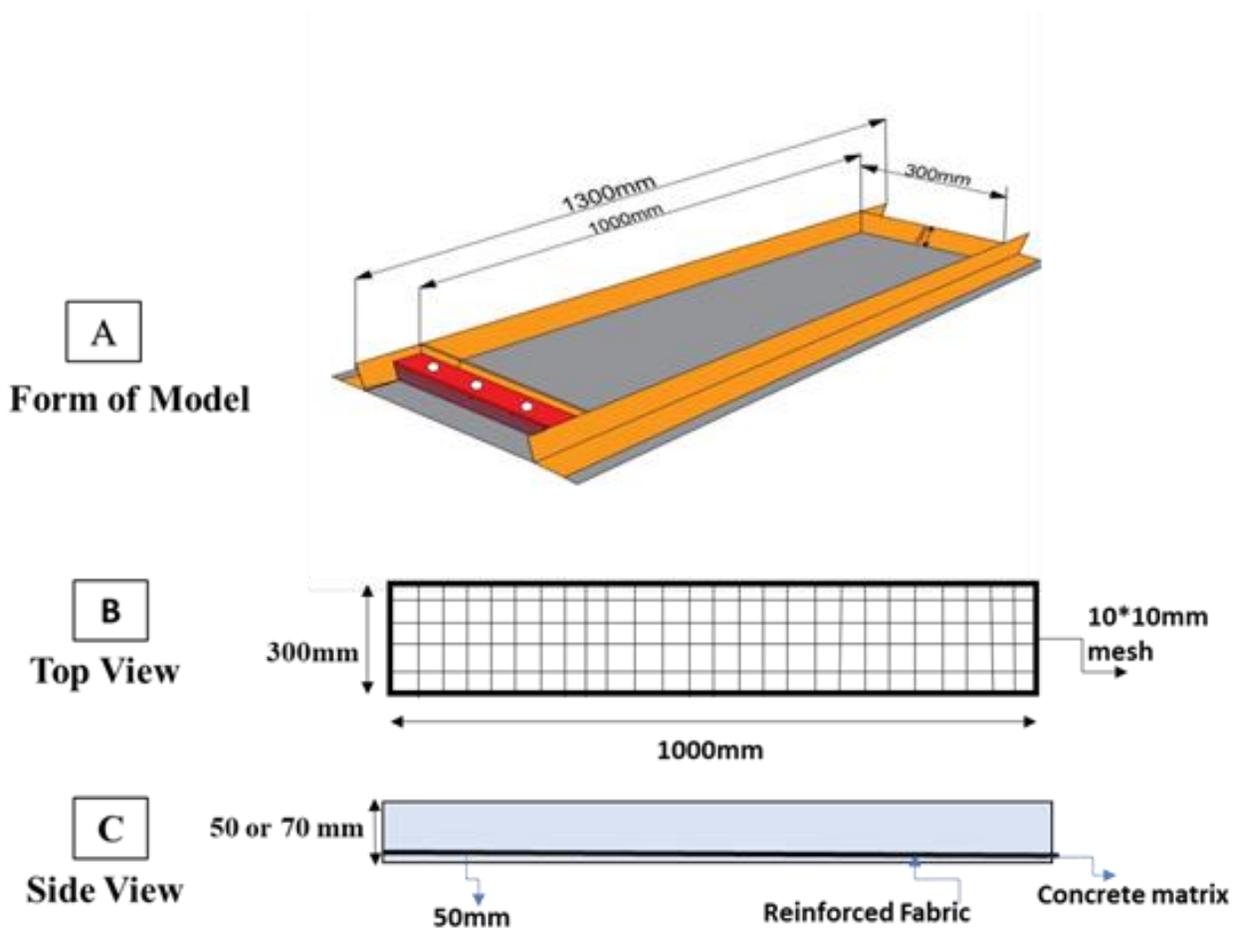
(a) Steel mold details (b) Specimen geometry top view and (c) Specimen geometry side view.
